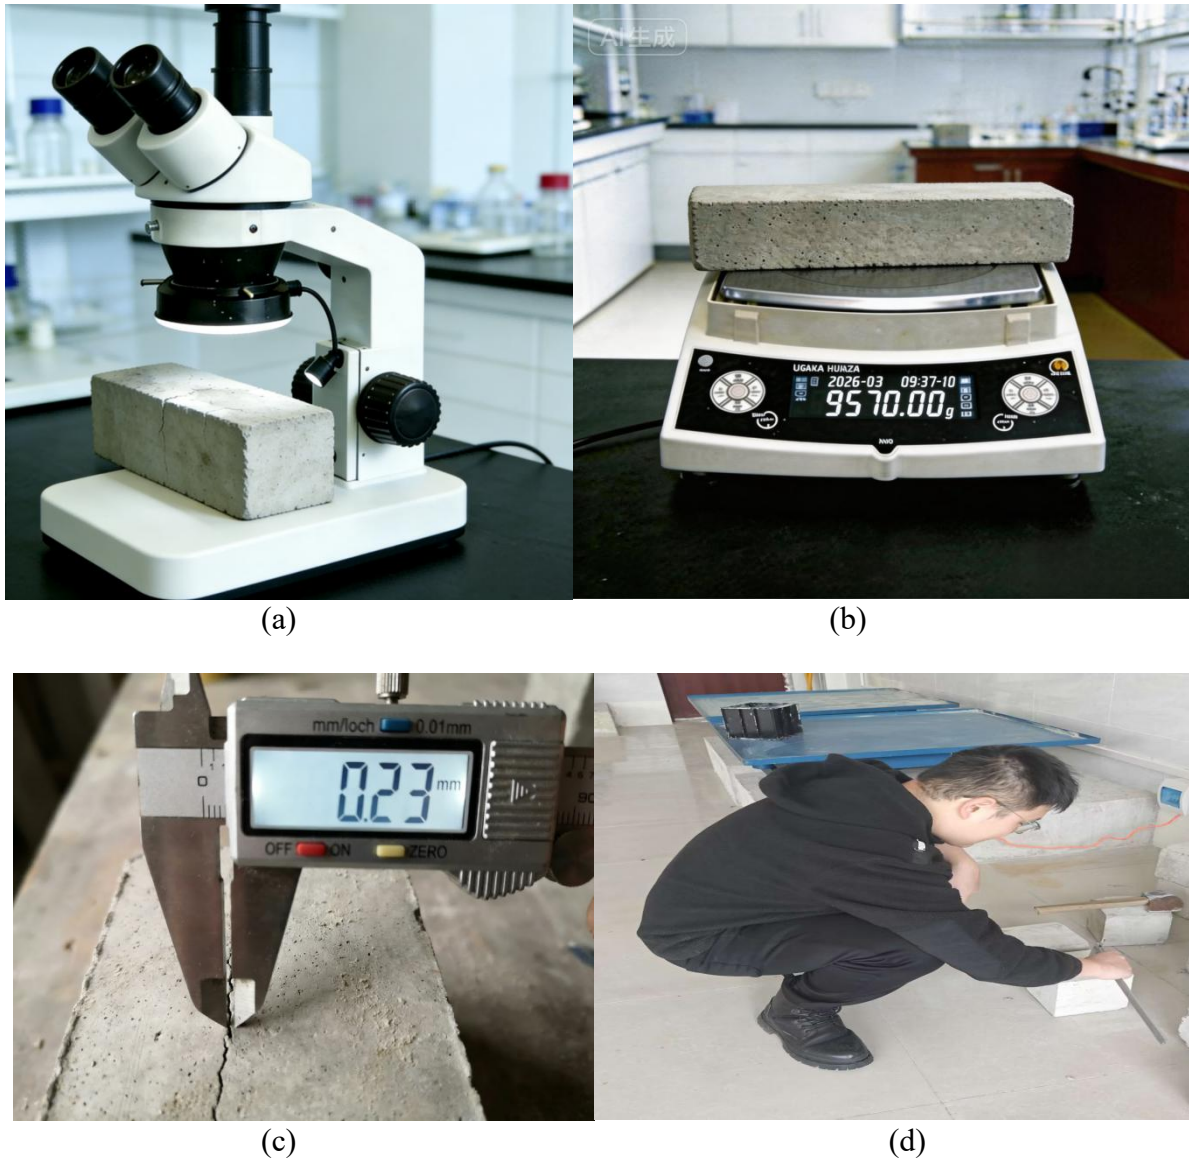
Crack width and surface deterioration measurement: (a) Crack width observation under a stereo microscope, (b) Mass measurement of specimen on a precision digital balance, (c) Crack width measurement using a digital vernier caliper (reading: 0.23 mm), and (d) Visual inspection and measurement of surface spalling area.
